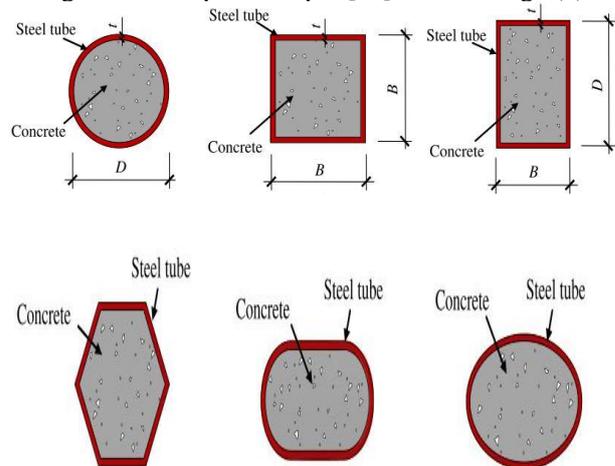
Typical cross section for Concrete filled Steel tubular cross sections [10]
